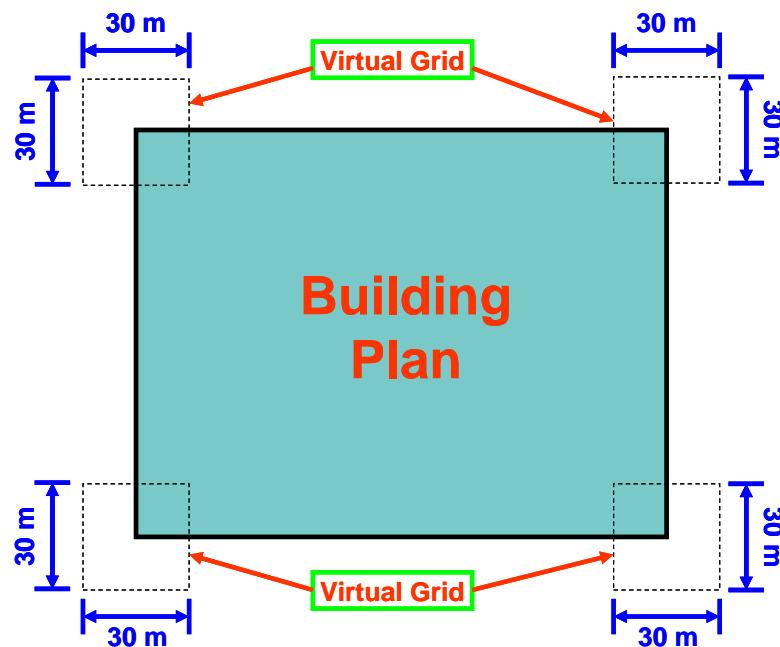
30 m square virtual grids at each corner of proposed building plan
